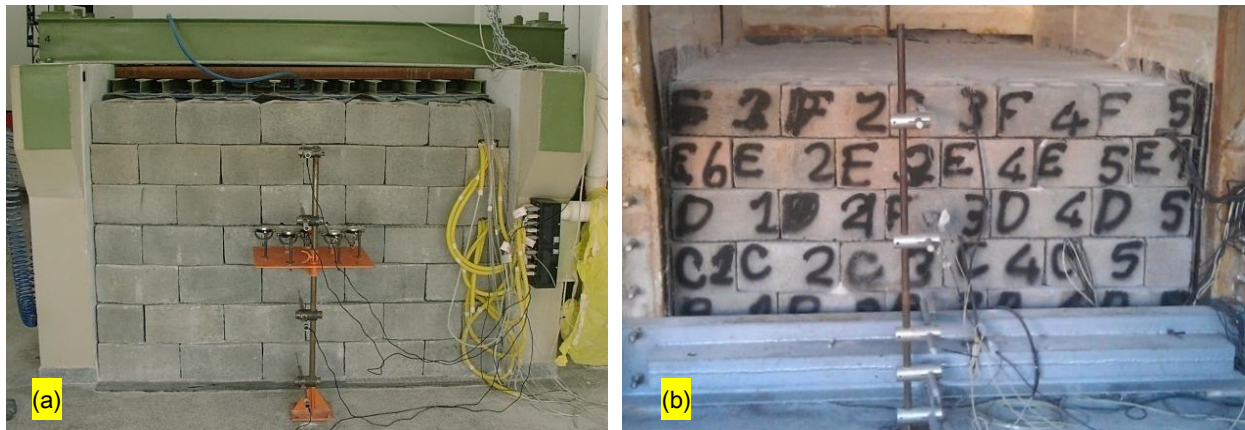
Front Views of Wall 1 (a) and Wall 3 (b)
